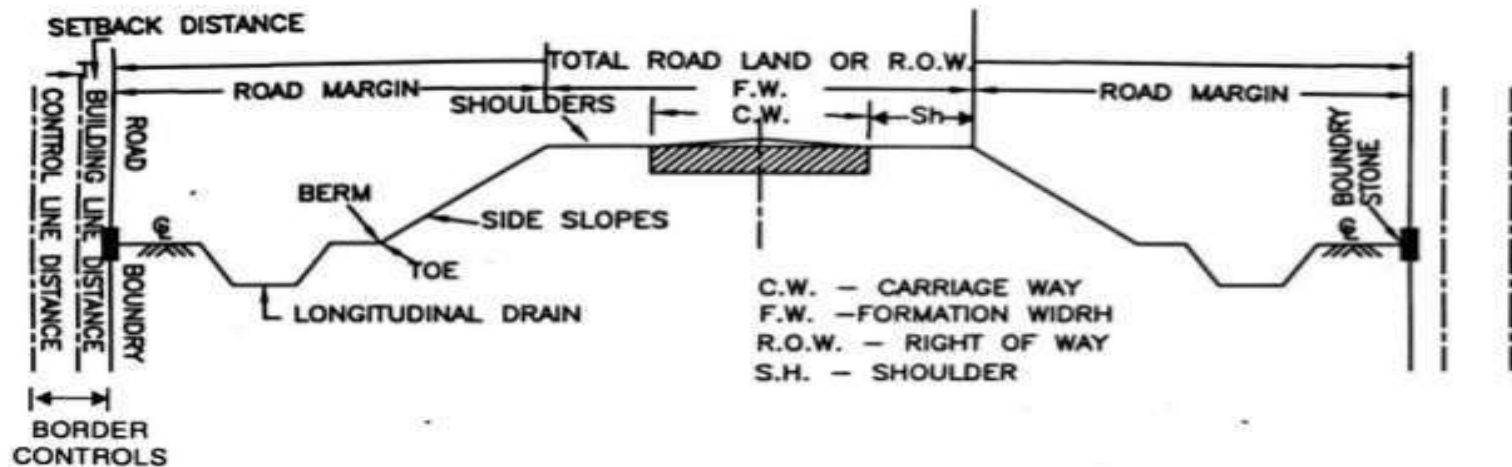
CROSS-SECTION OF ROAD IN EMBANKMENT
